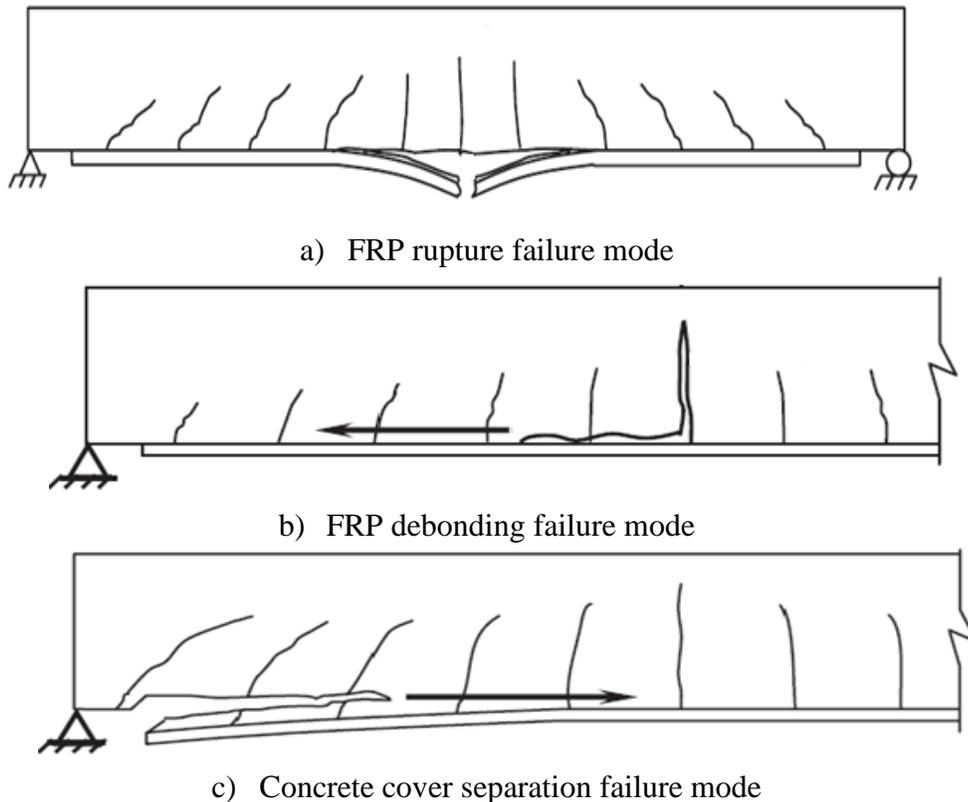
Conventional failure modes of externally strengthened reinforced concrete members with FRP laminates
